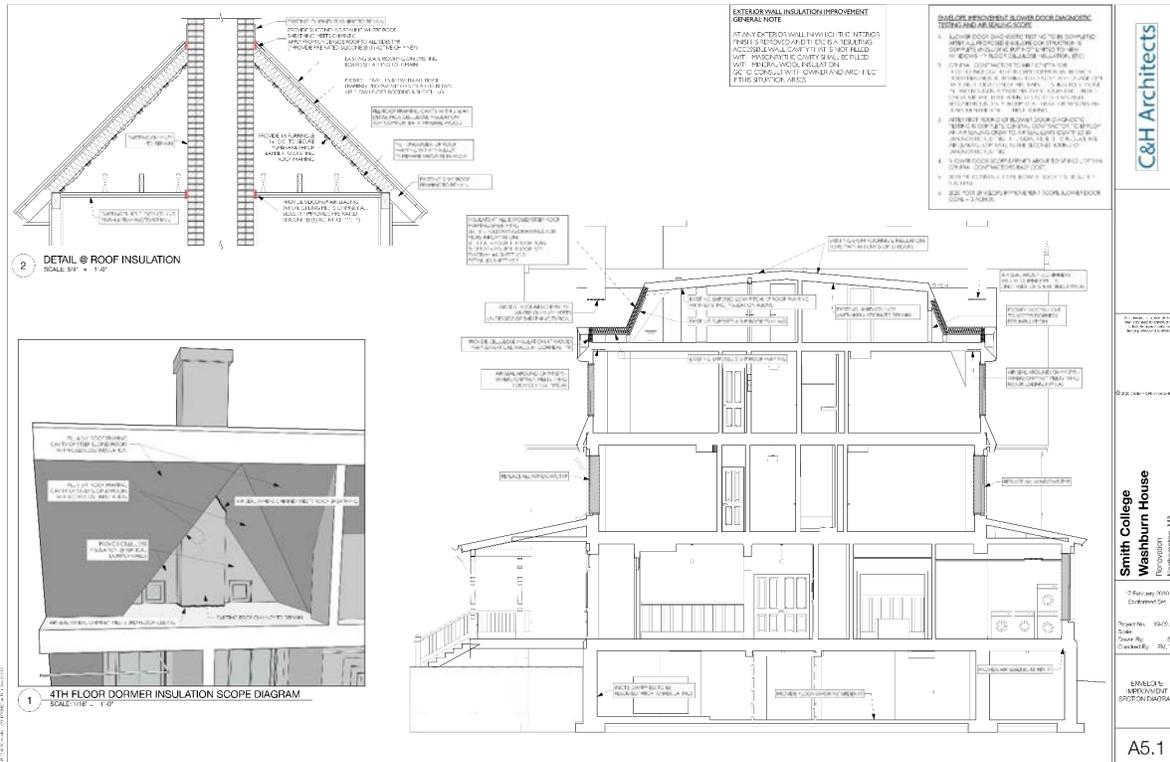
Roof section, depicts the plan for air sealing and insulation to reduce heat loss
